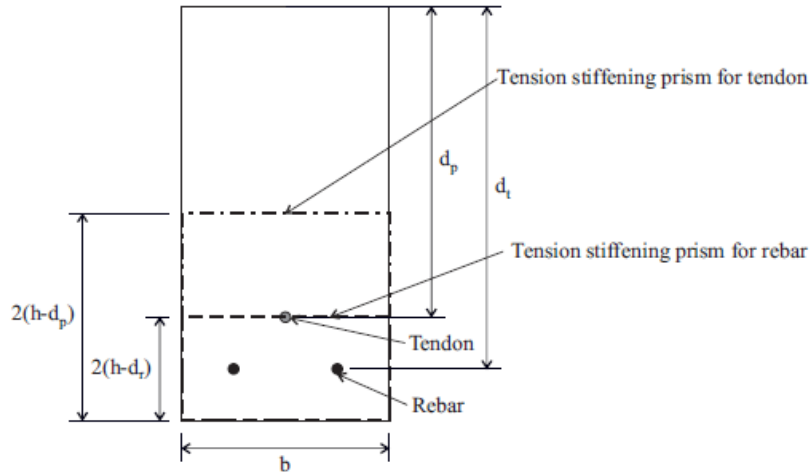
Tension stiffening prism with prestressed and non-prestressed reinforcement
